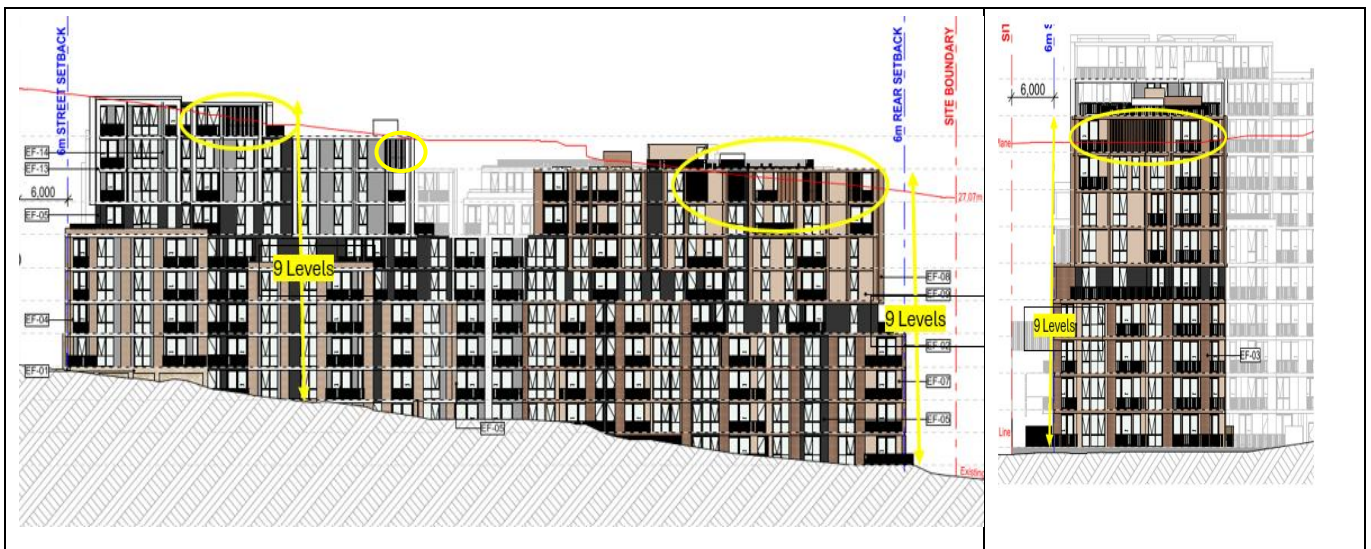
| eastern elevation (left) and northern elevation (right) of Building 3 facing adjoining residential sites (Base source: Additional Information)
